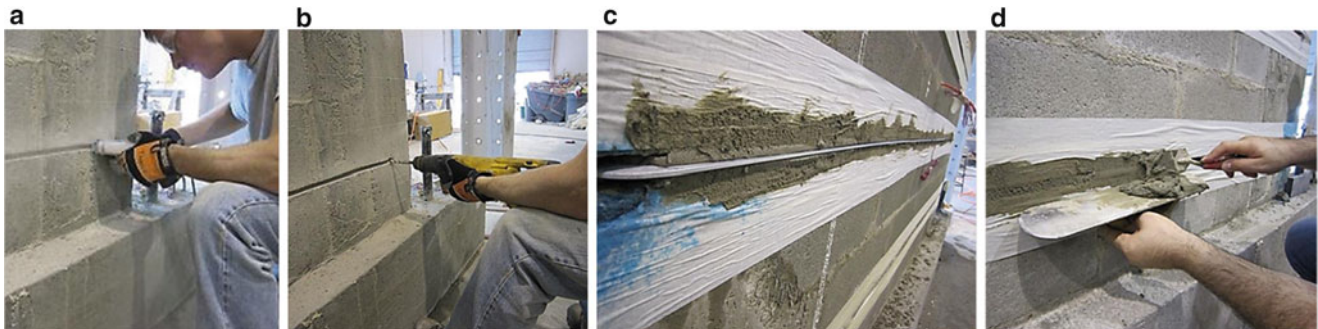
Retrofit of specimen WR: (a) cutting grooves along bed joints; (b) drilling anchorage holes in tie columns; (c) embedding aluminum strips in mortar; and (d) filling grooves with mortar
